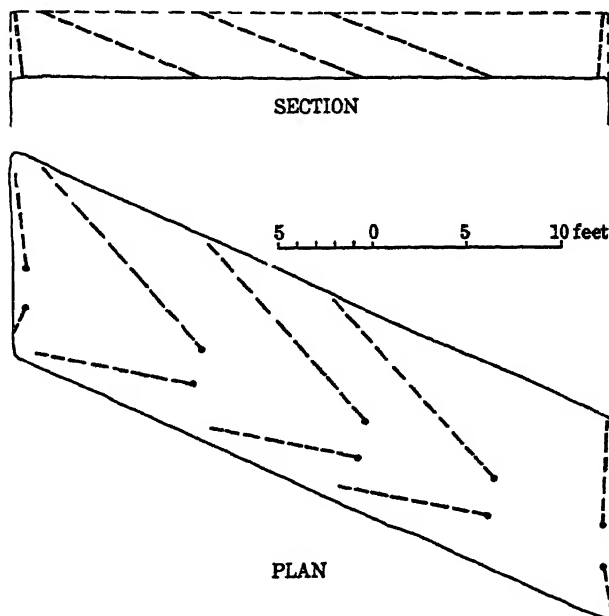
FACE OF HEADING AND STOPE, SHOWING ARRANGEMENT OF HOLES.
